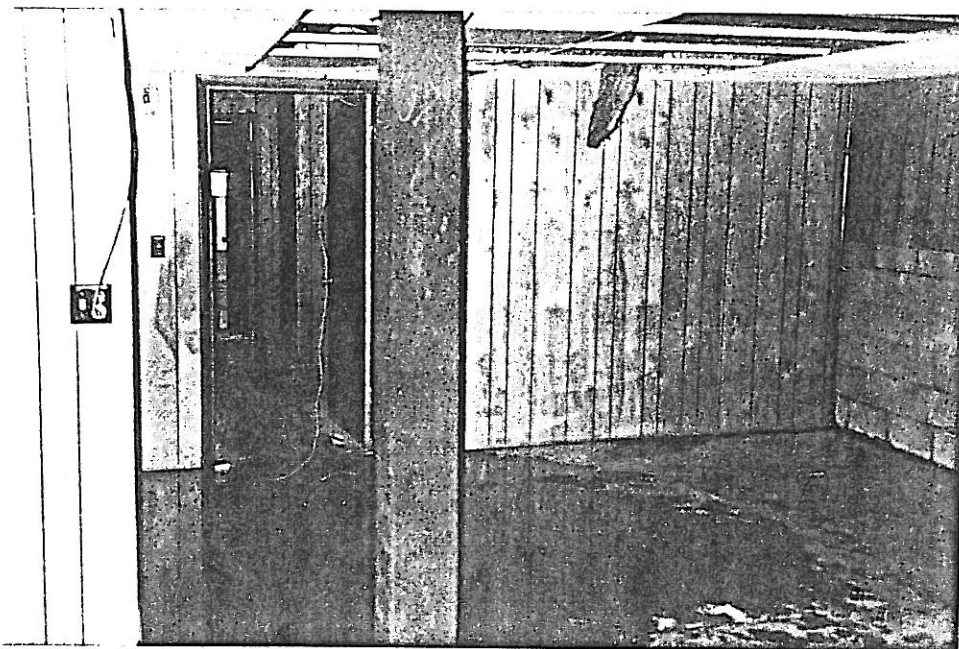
BASEMENT AREA; DOORWAY IN BACKGROUND IS TO THE APARTMENT UNIT, STANDING WATER ON FLOOR SURFACE, PHOTO TAKEN FROM ENTRY DOOR TO BASEMENT.
